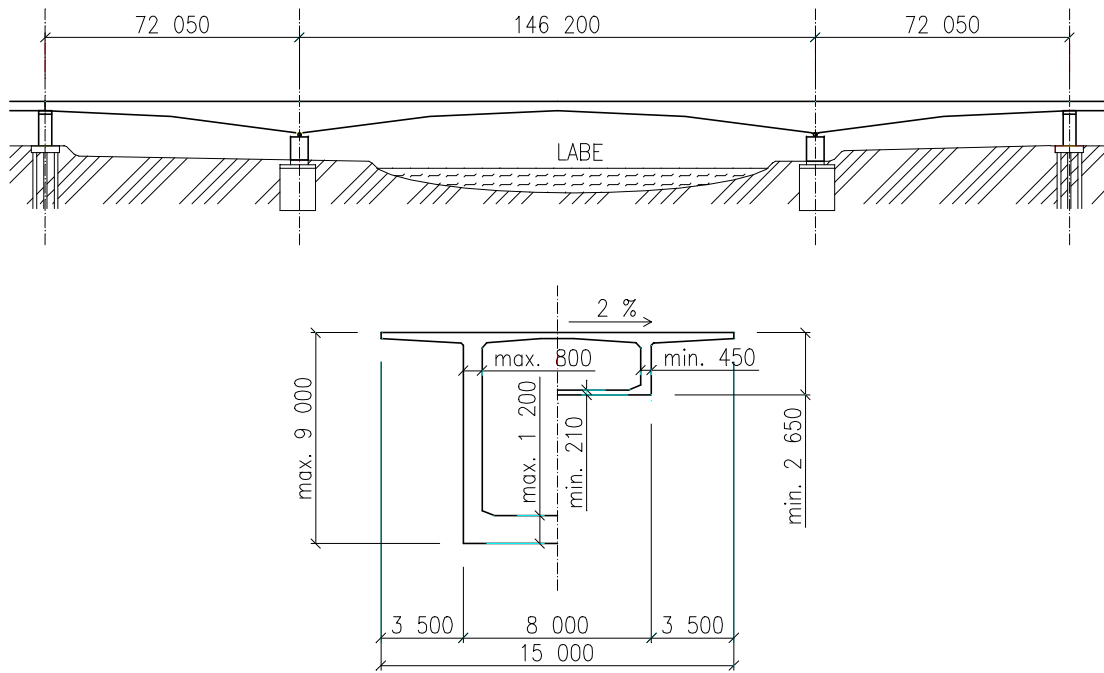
Elevation and a typical cross section of the bridge at Melnik
